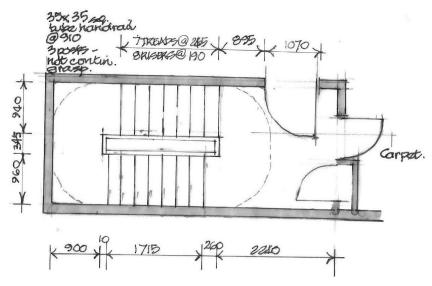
Clean or Main Stair Building M3 - Plan View
